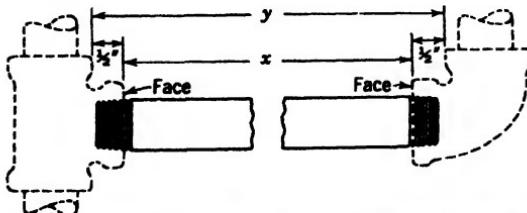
A method of measuring where exact dimensions are not important.
